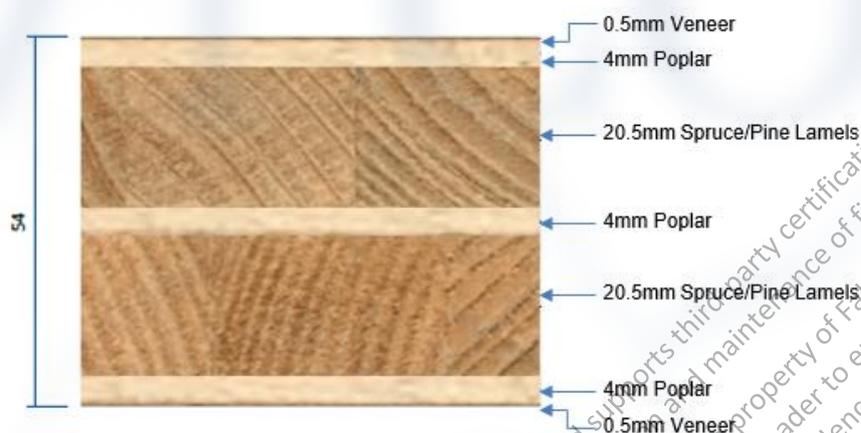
Leaf 1 (Type 1) Stredor 54 with plywood facing
